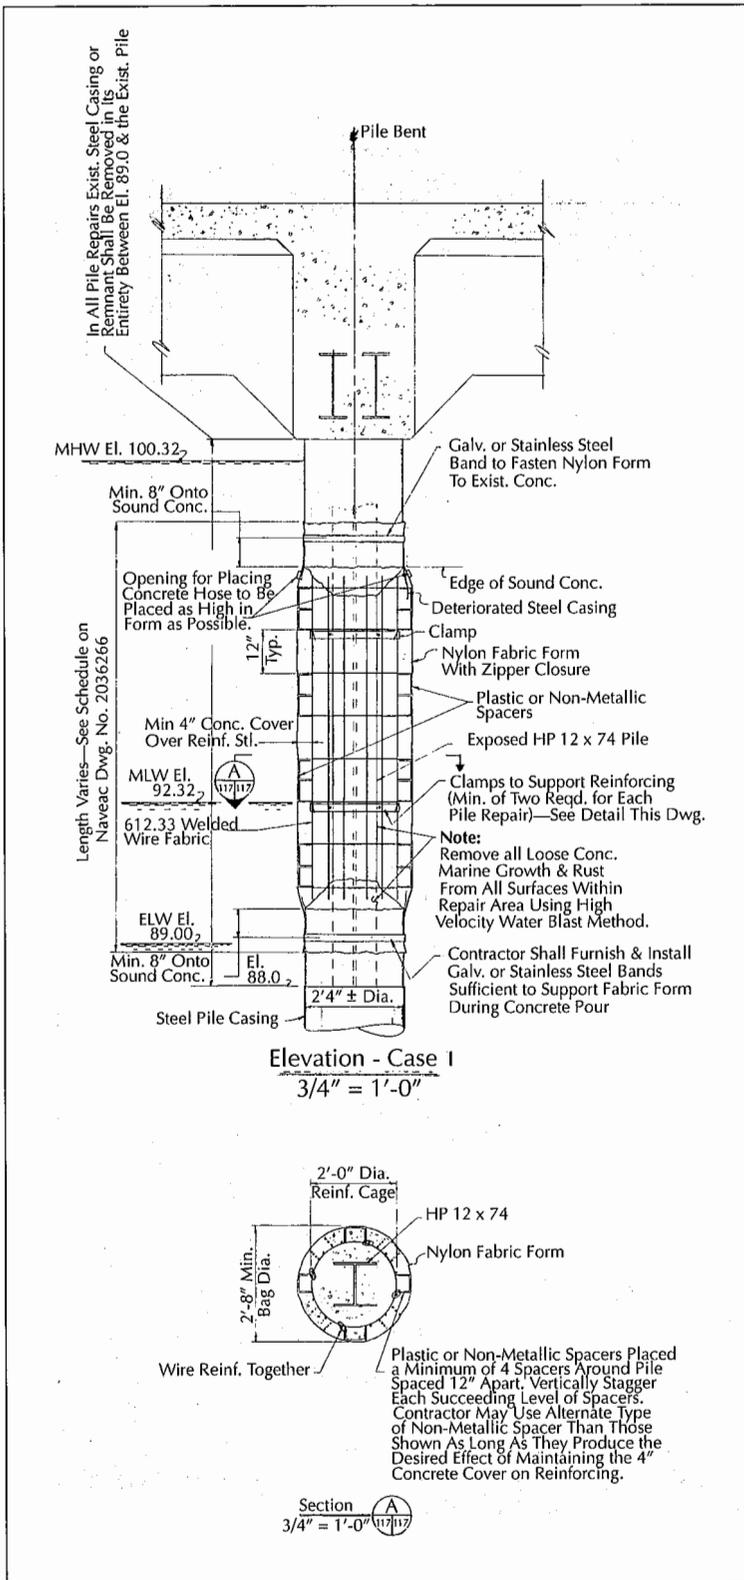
Pile jacket detail (from 1983 archive drawings).
